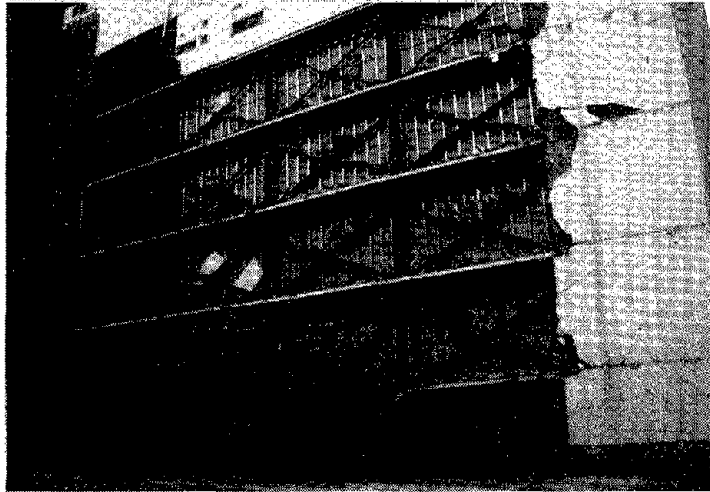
Elevation of damaged X-braced steel frames
